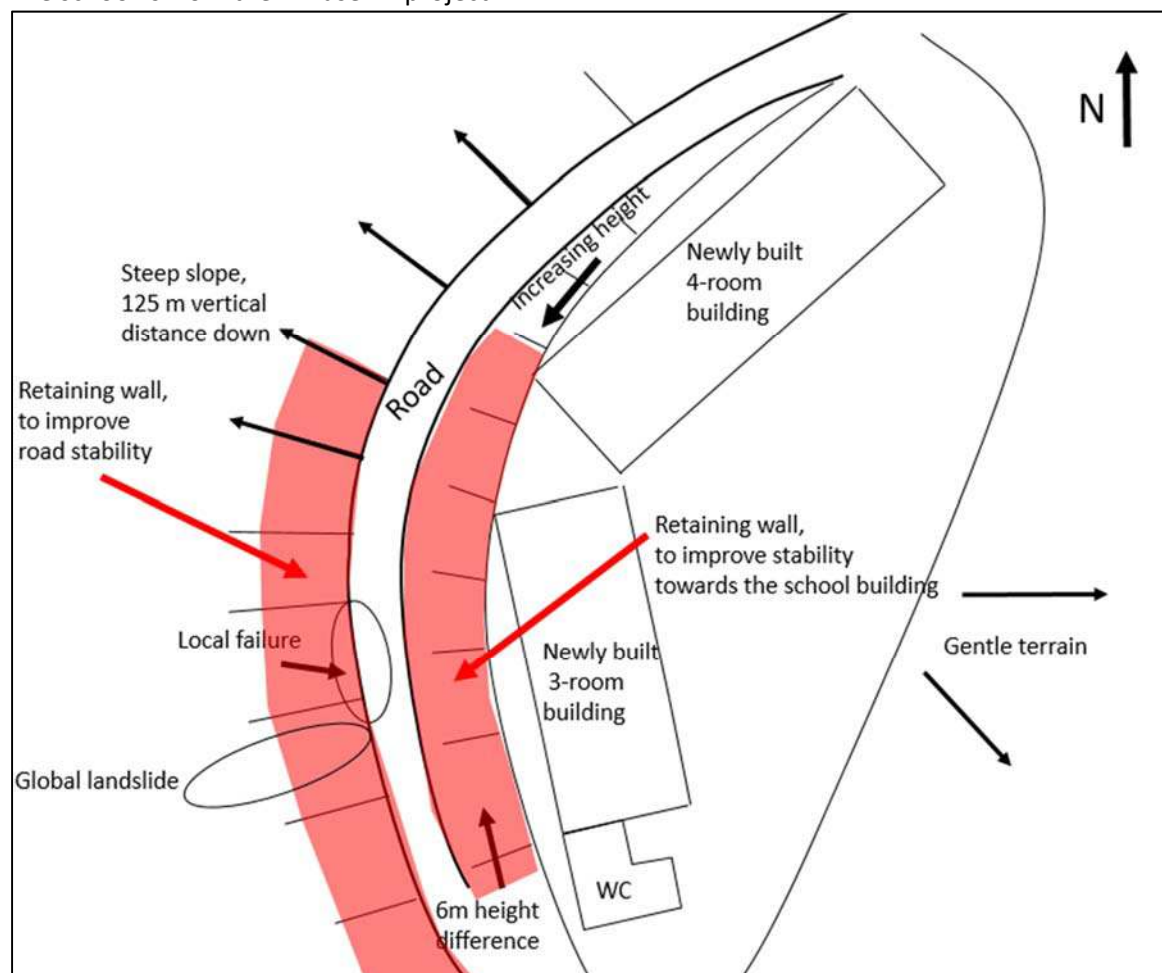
Plan view - Himali Devi. Two retaining wall west of the plot should be constructed; one to improve the road stability and one to improve the stability towards the school building.
